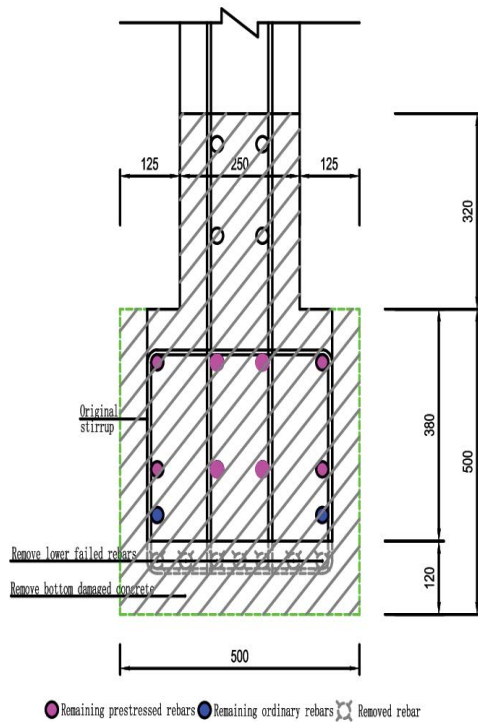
Residual cross-sectional view of the T-beam after removing the damaged concrete (mm).
